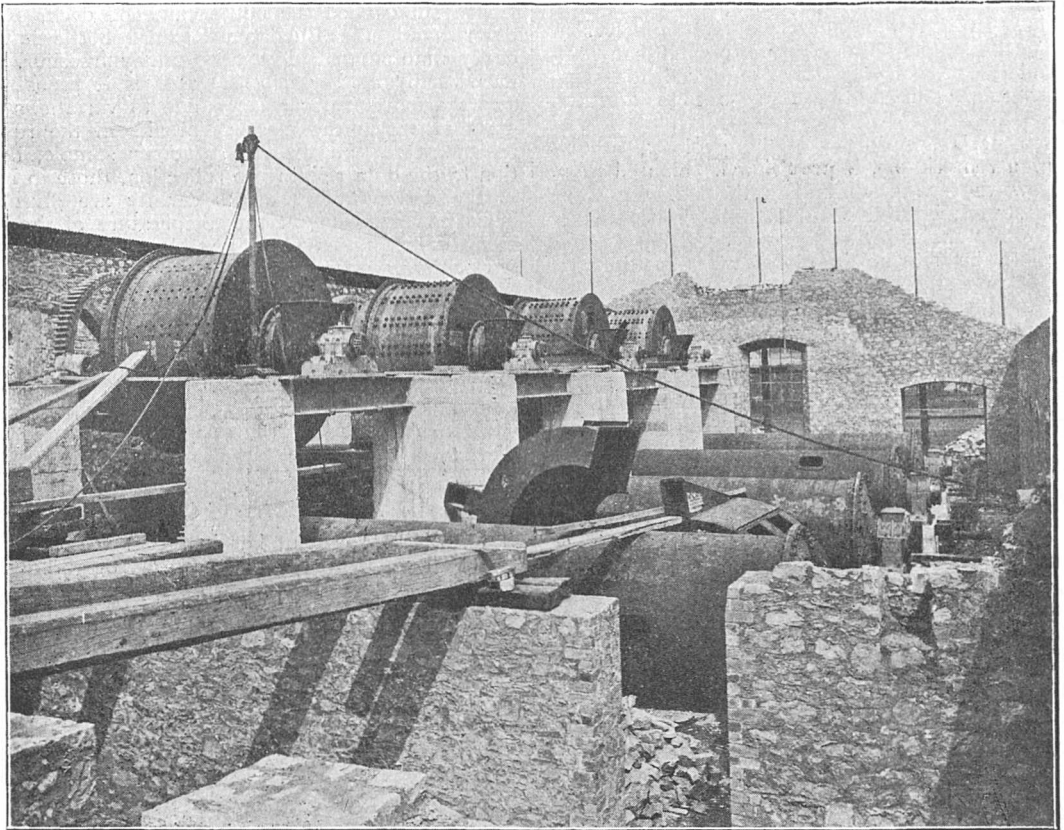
Raw-mill grinding-house at Aberthaw during construction, showing arrangement of ball and tube-mills.
